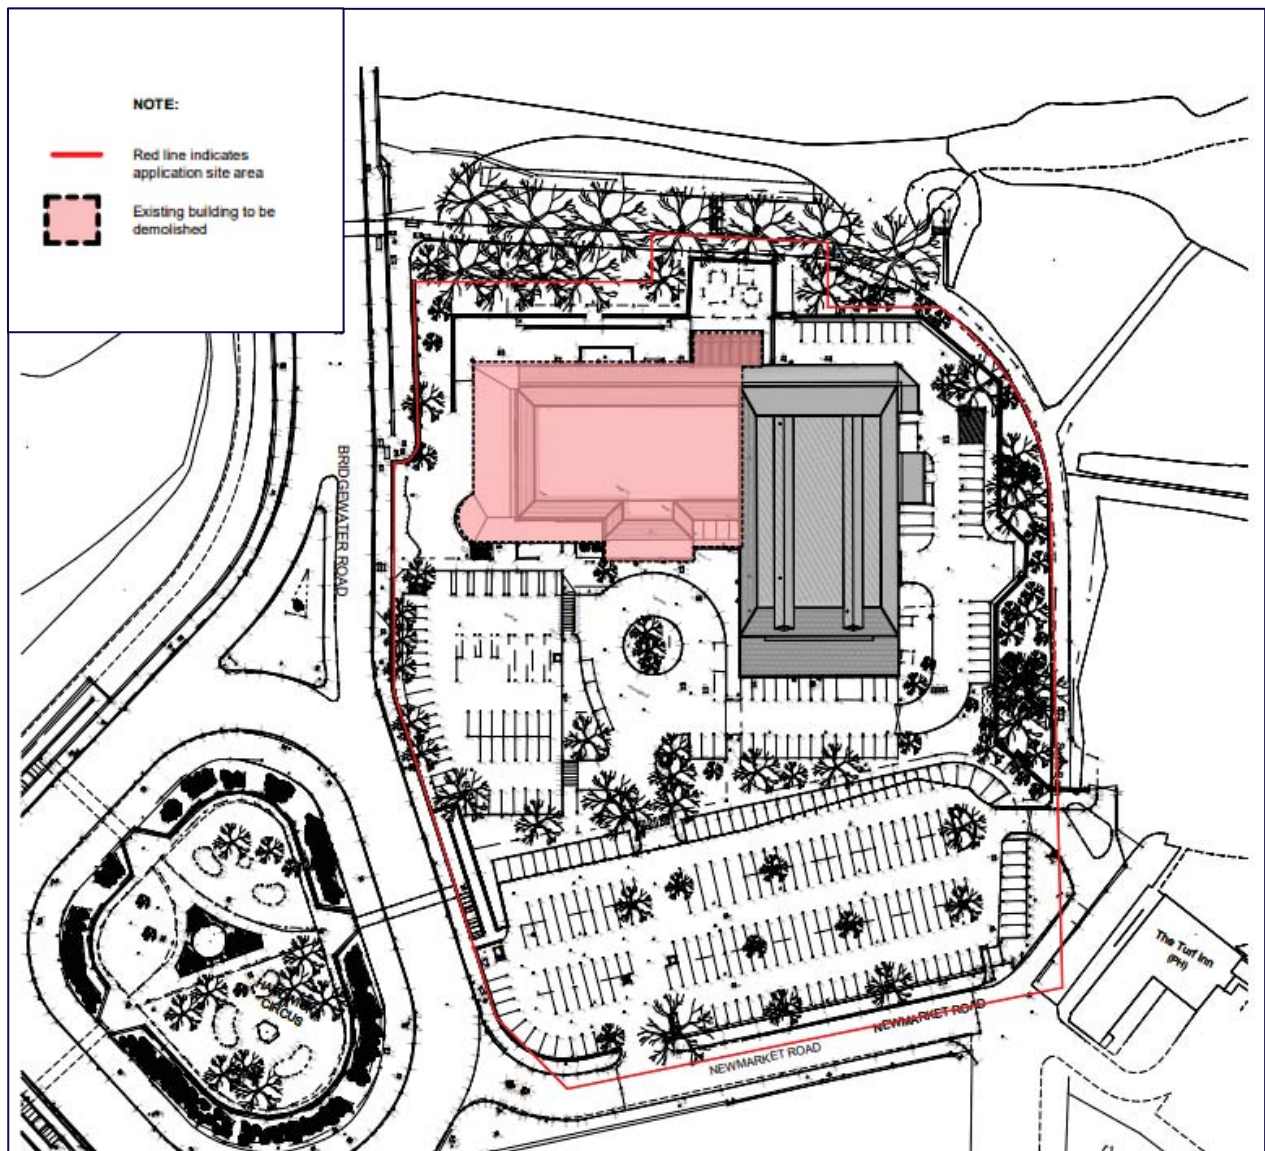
5 Existing site plan showing area to be demolished in red (DWG: 17024-GT3-00-XX-DR-A-08-9003-S2-P01 Revision P01 (28/08/28))
